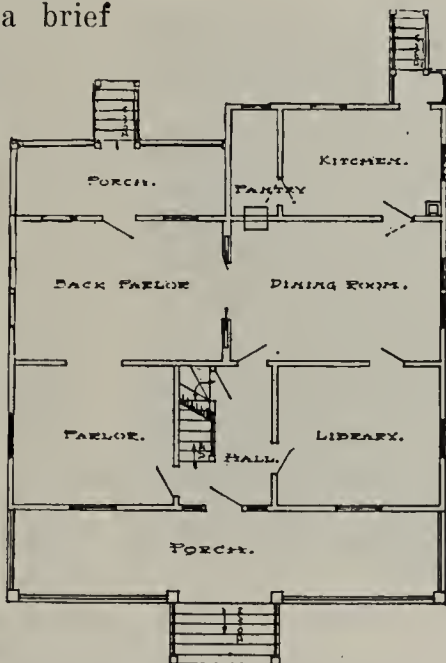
The ground-floor plan of the house shown in Figure 4, capable of taking care of four patients. It need not be remodeled, but some repairs are necessary.
